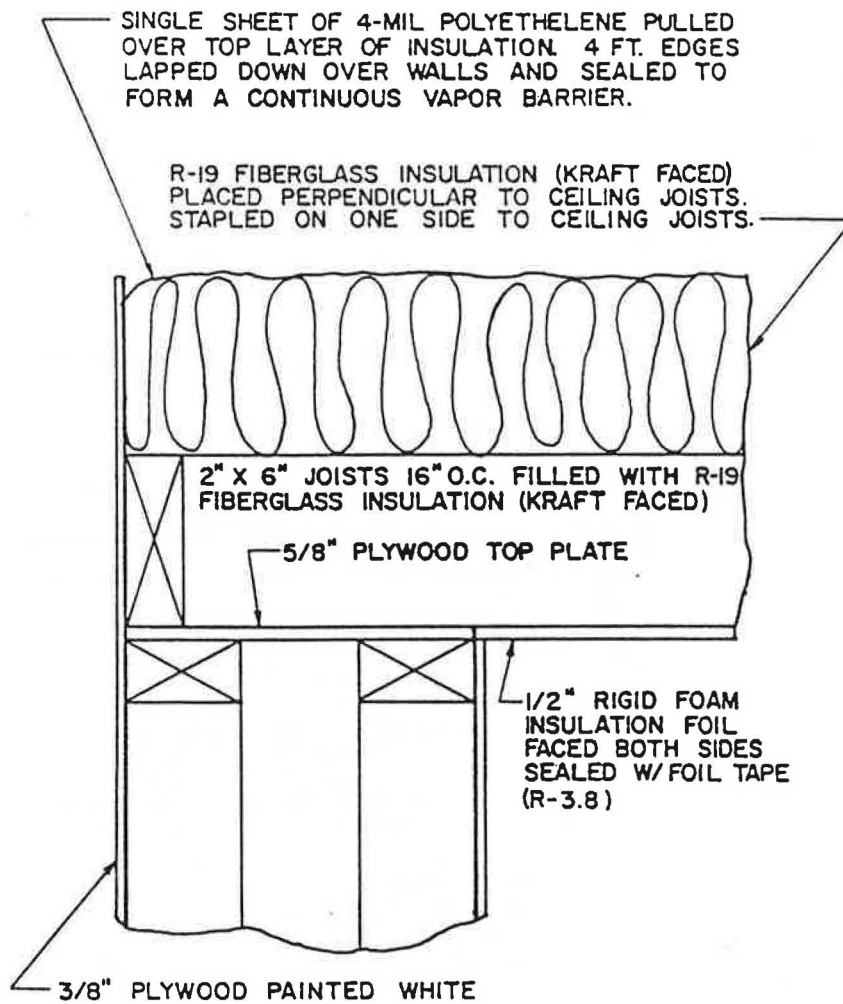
Cross-sectional view of the ceiling and wall joint.
